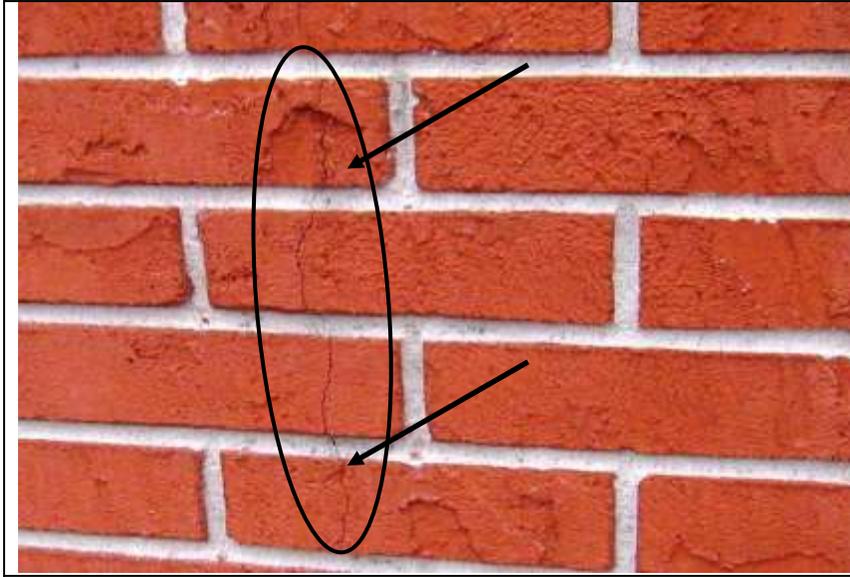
Hairline cracks systemic throughout the brick faced cladding; typical of stucco-like cladding applications
